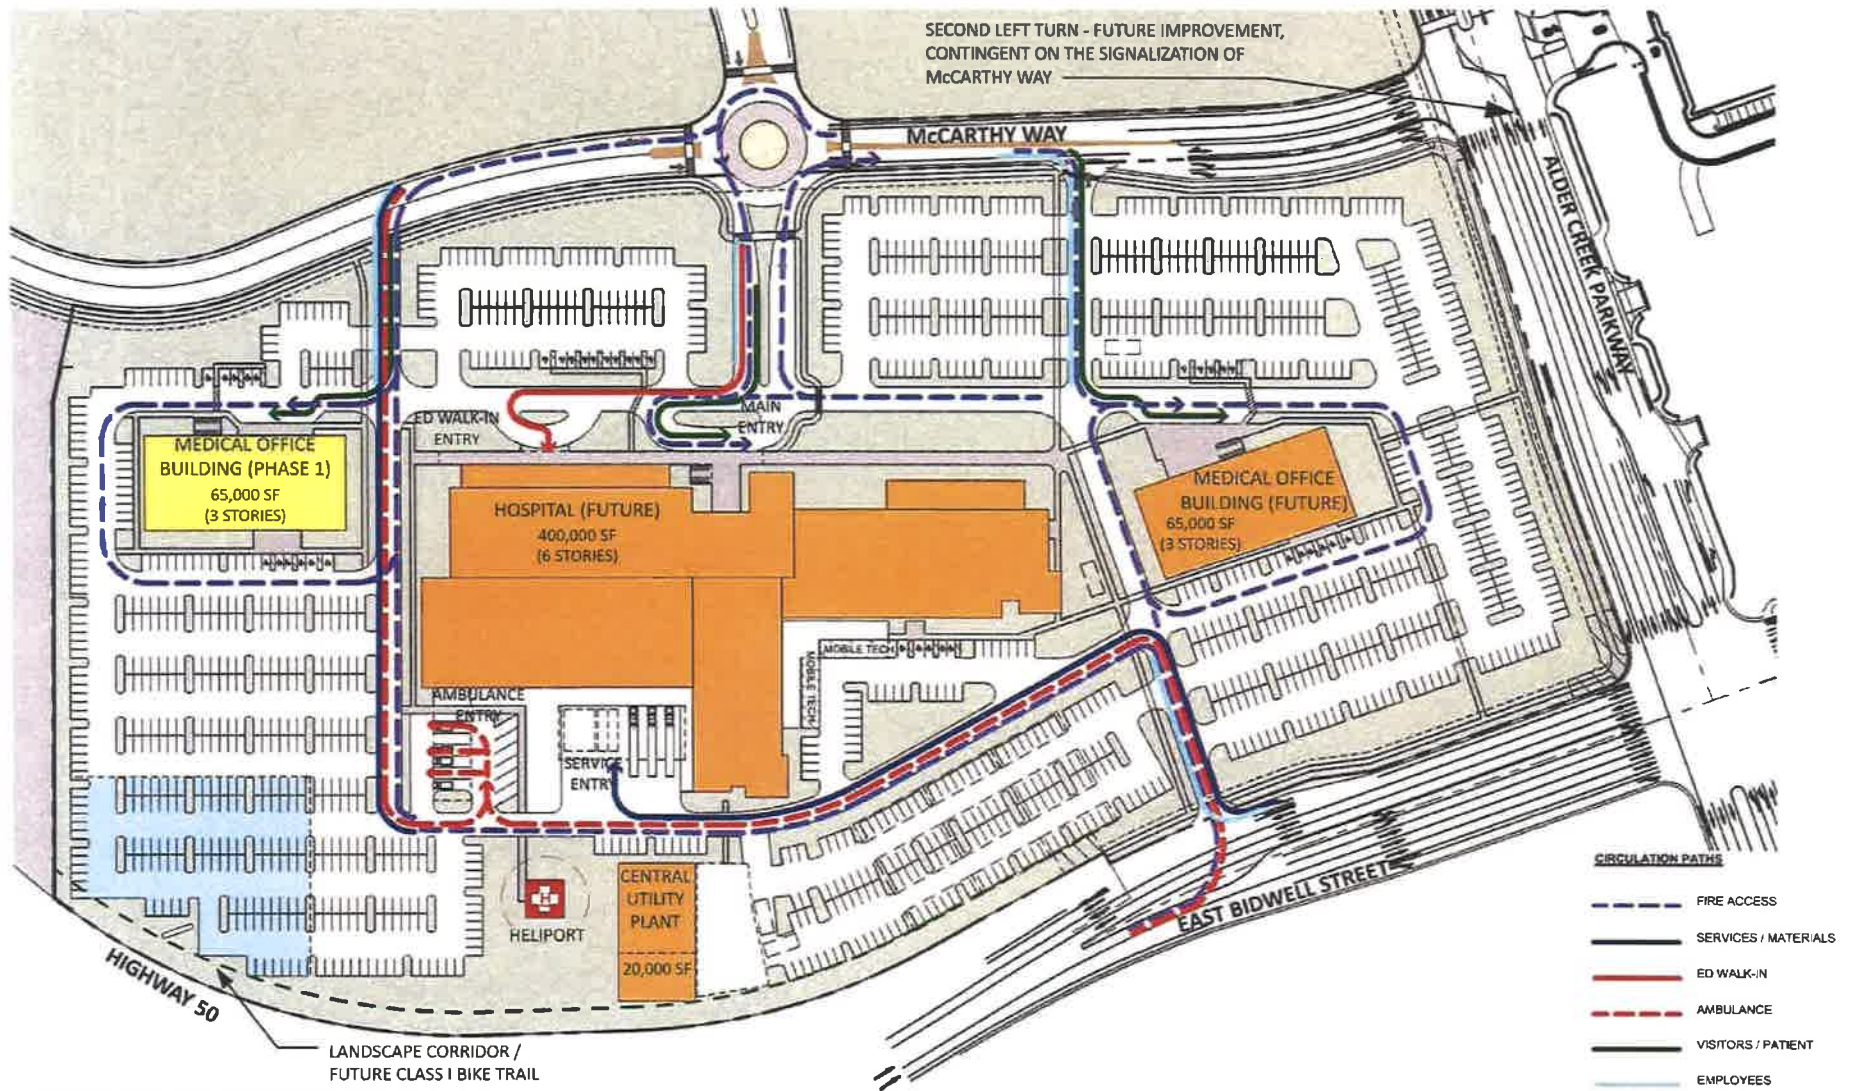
EXHIBIT D: SITE CIRCULATION FLOW PLAN
